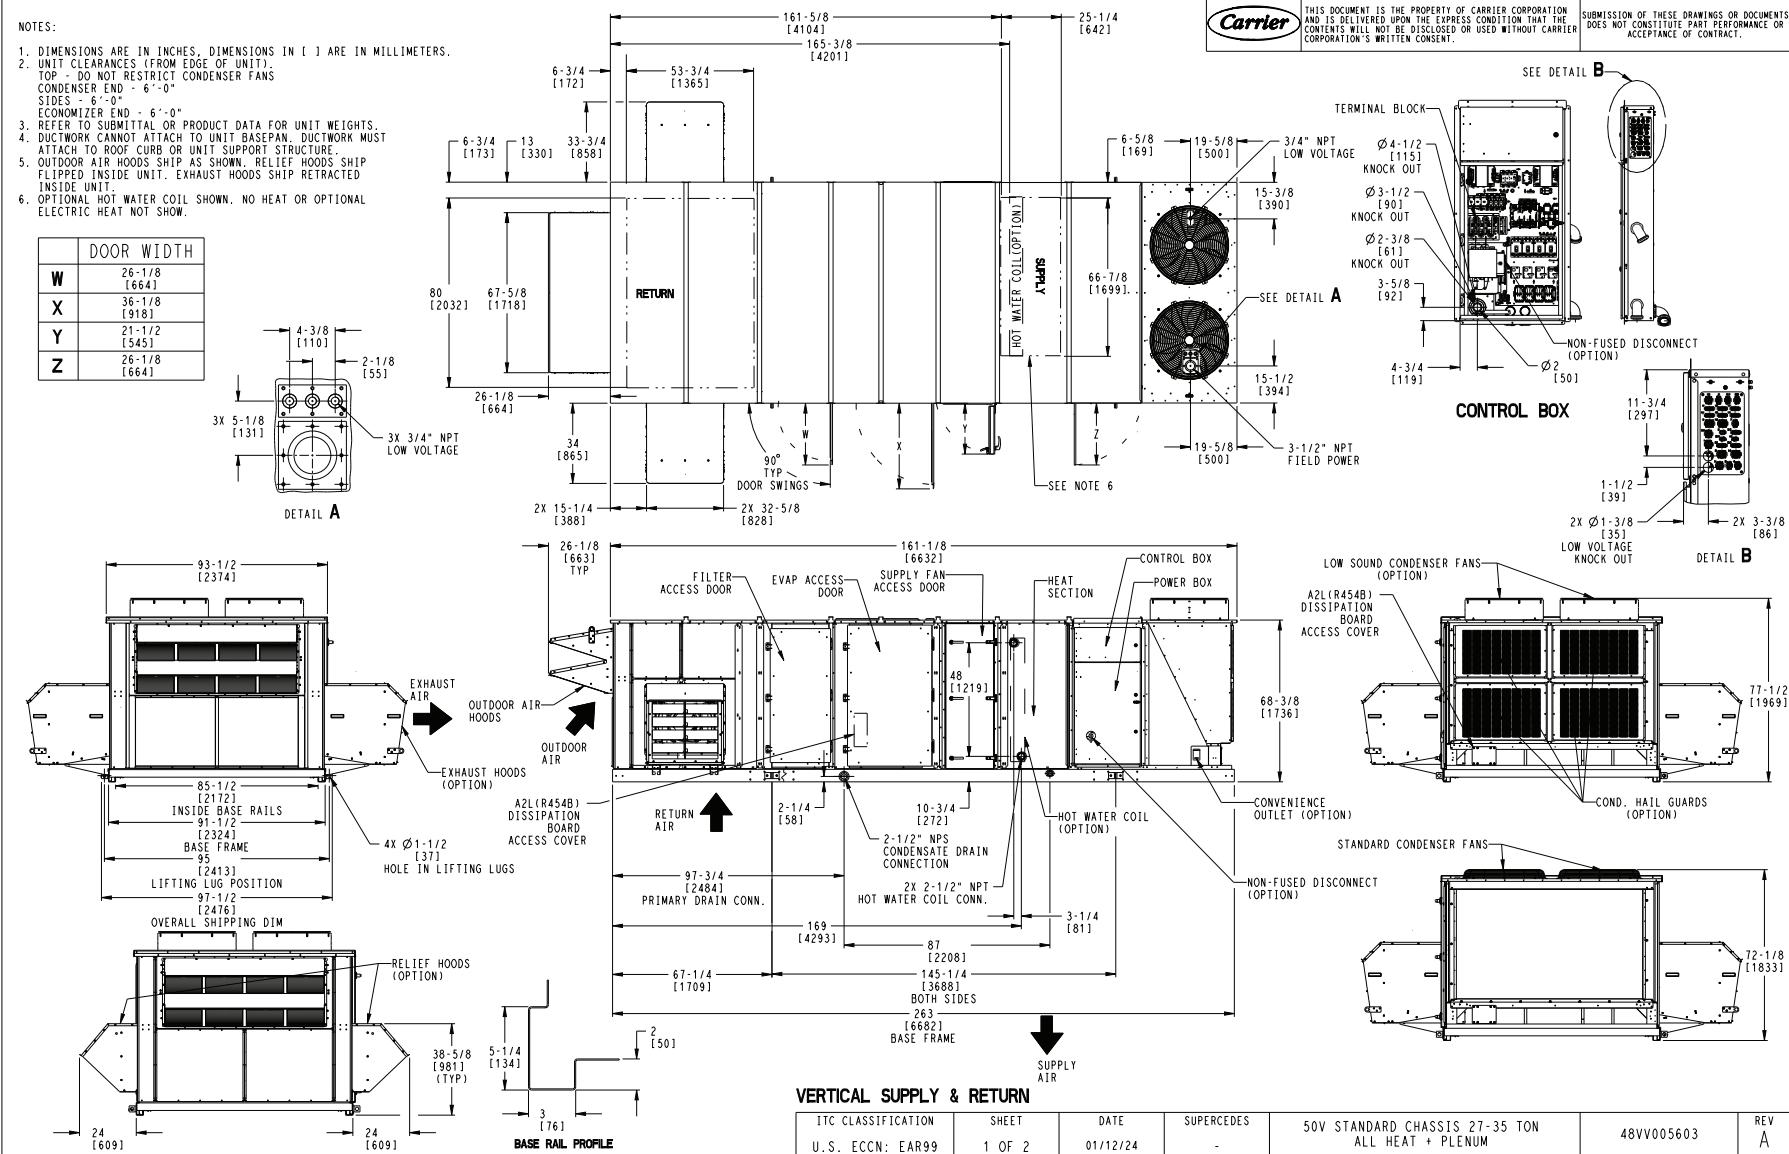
50V 27.5-35 Ton Standard Chassis with Plenum Section
